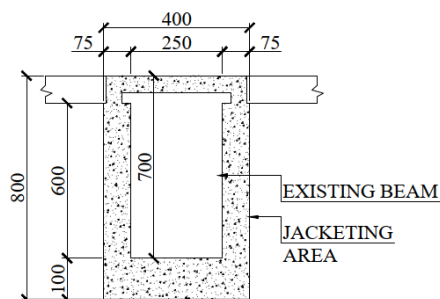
Typical Cross Section Showing Dimensional Detail of Beam
